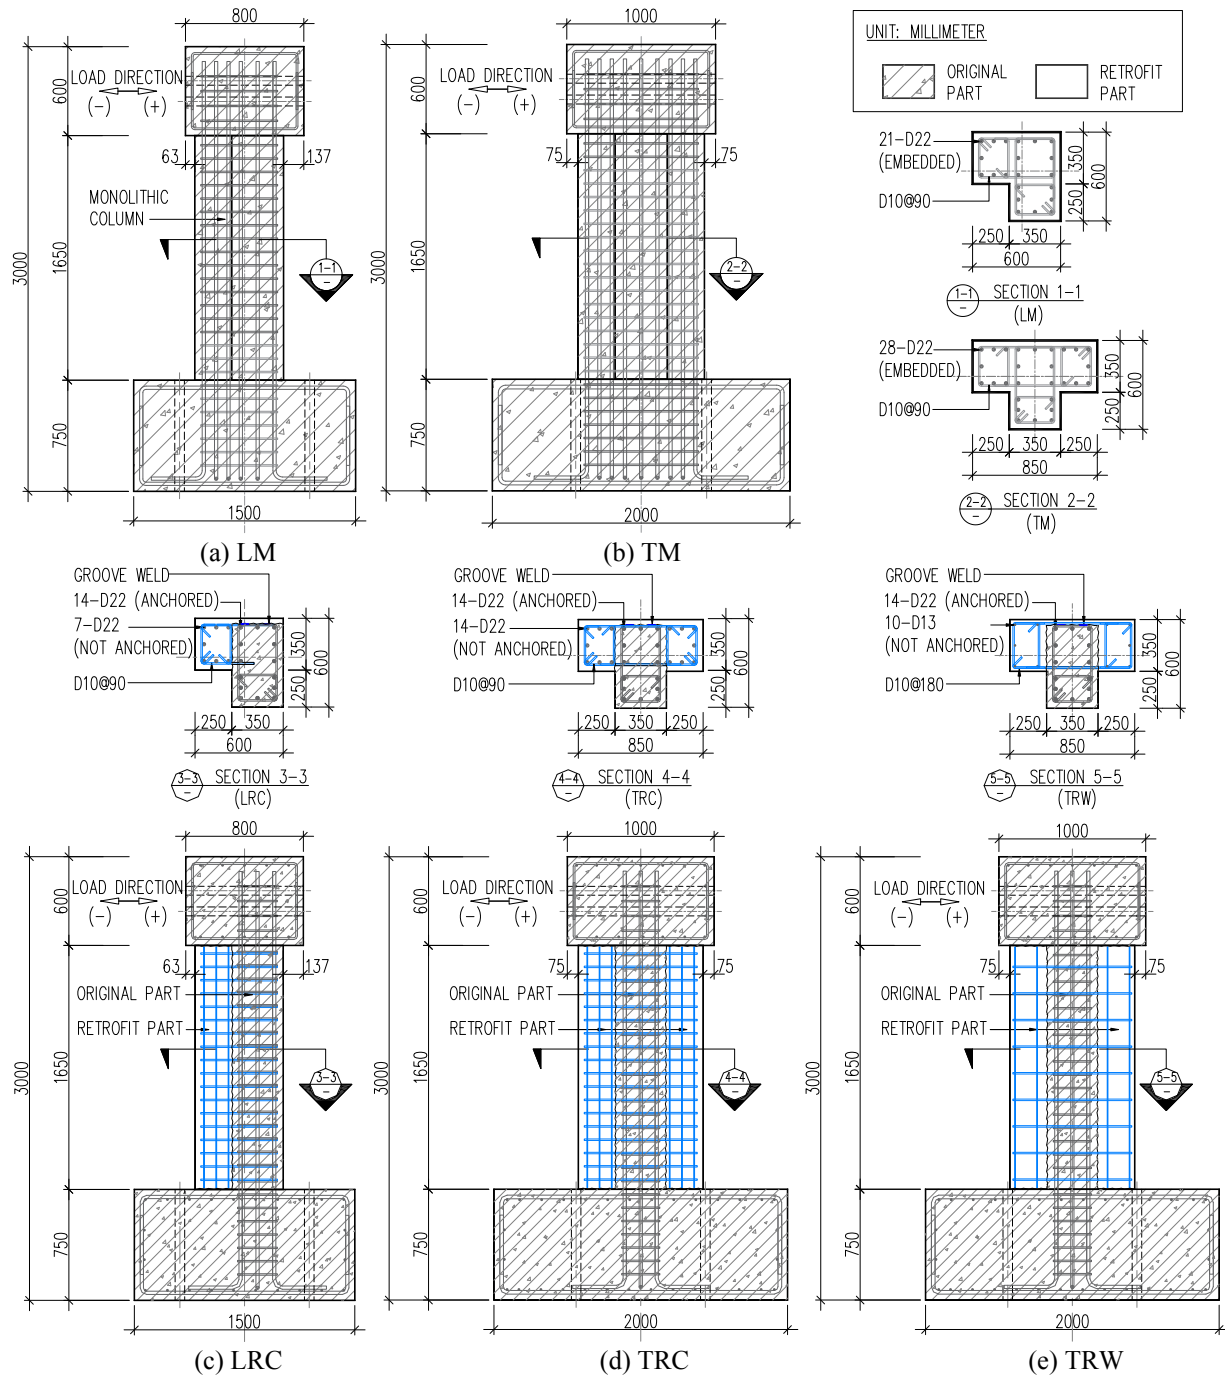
Reinforcement and cross-sectional details for column: (a) LM; (b) TM; (c) LRC; (d) TRC; and (e) TRW
